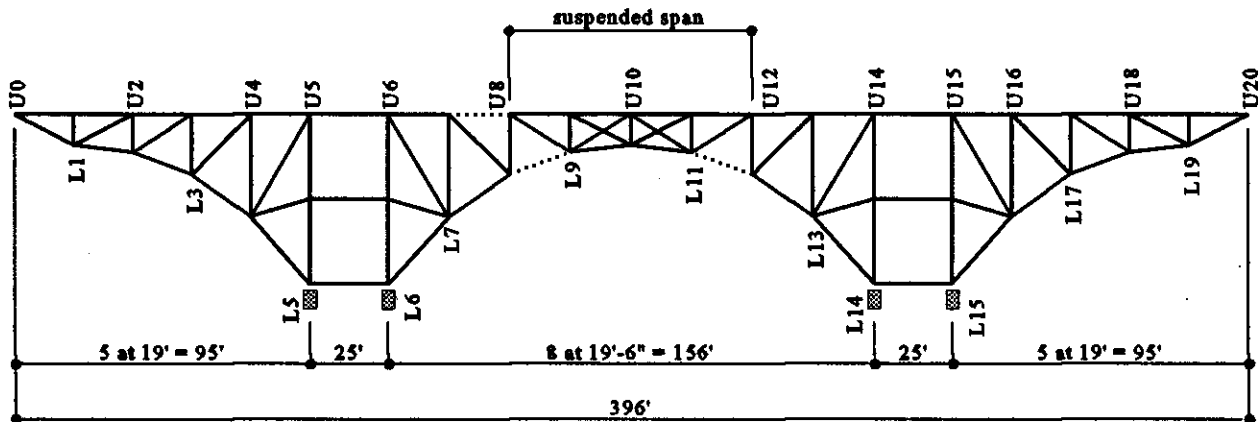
Elevation of Davis Avenue Bridge. Sketch by Justin M. Spivey.
